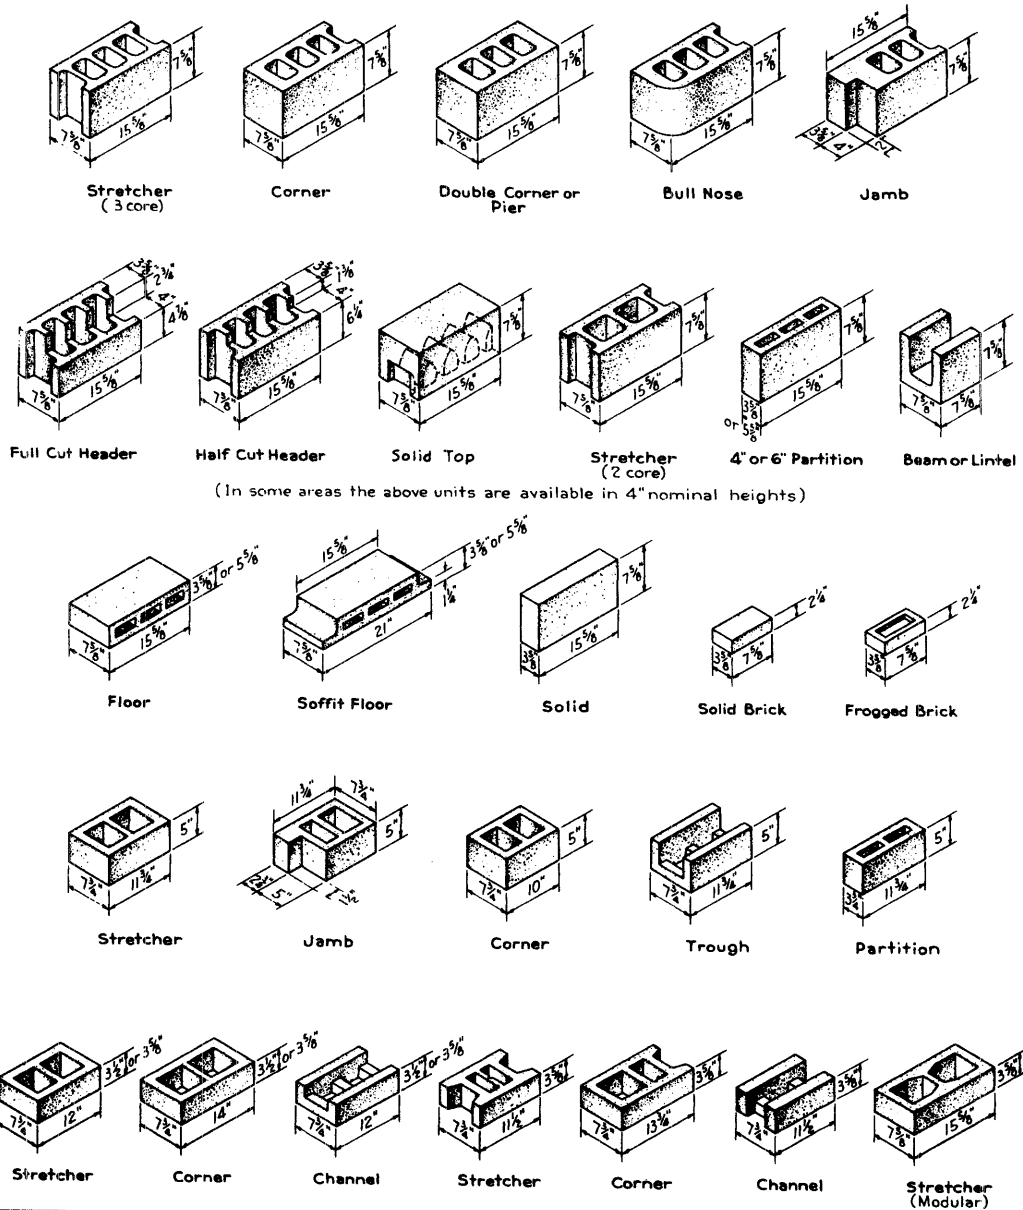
Typical concrete masonry units. (Courtesy of Portland Cement Association)
